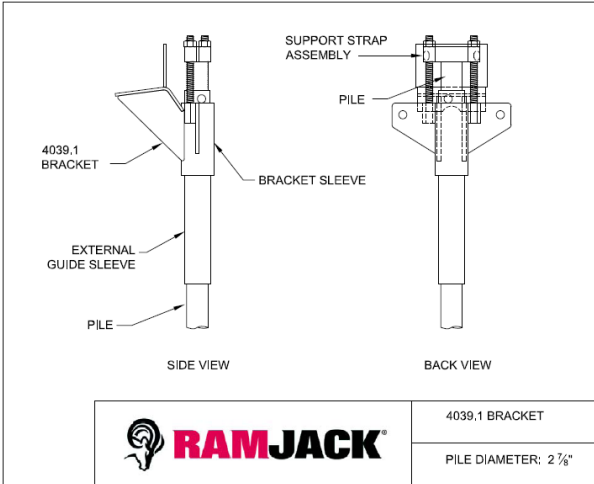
4039.1 SUPPORT BRACKET AND PILING
